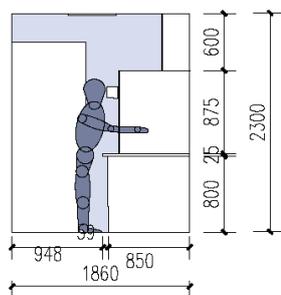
Modified Elevation of the Adjacent Transition Space (Kitchen-Side Bathroom) (Source: Self-drawn)
